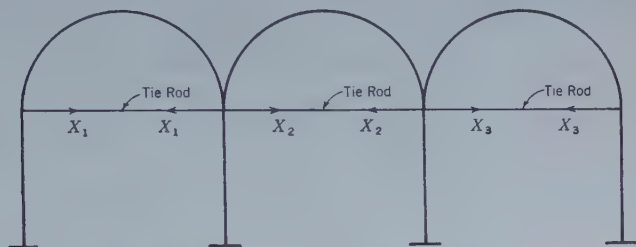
MULTIPLE-SPAN ARCH ON ELASTIC PIERS WITH TIE-RODS AT JOINTS.
